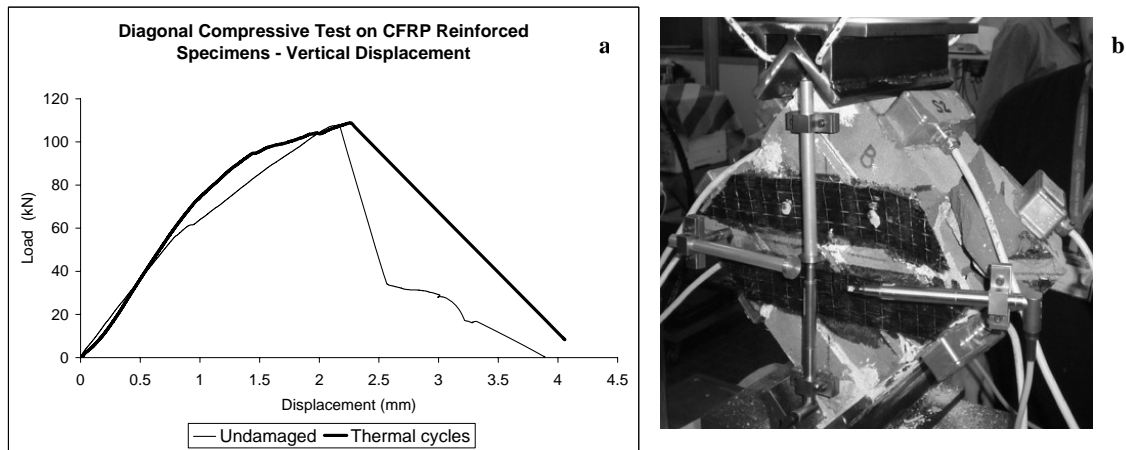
Diagonal compressive test on CFRP specimens after thermal damage and in undamaged condition (a). MF02 specimen after collapse for plate end debonding and ripoff failure mode (b).
